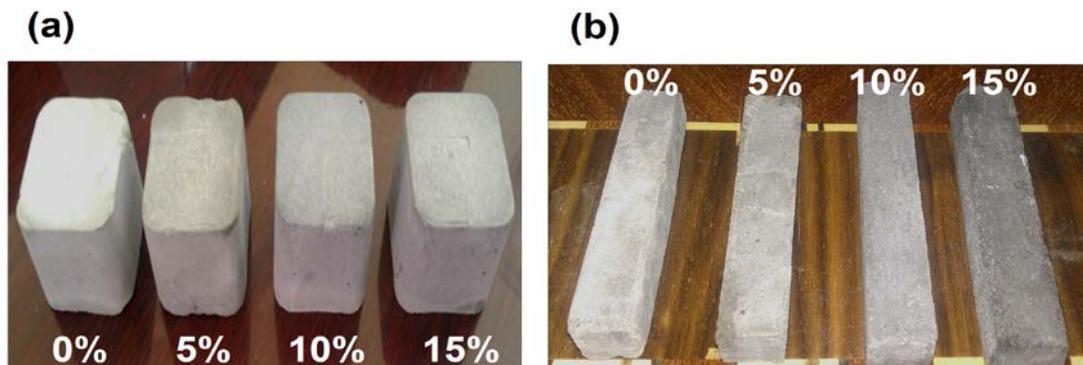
(a) Specimens for compression test (b) Specimens for bending and impact test
